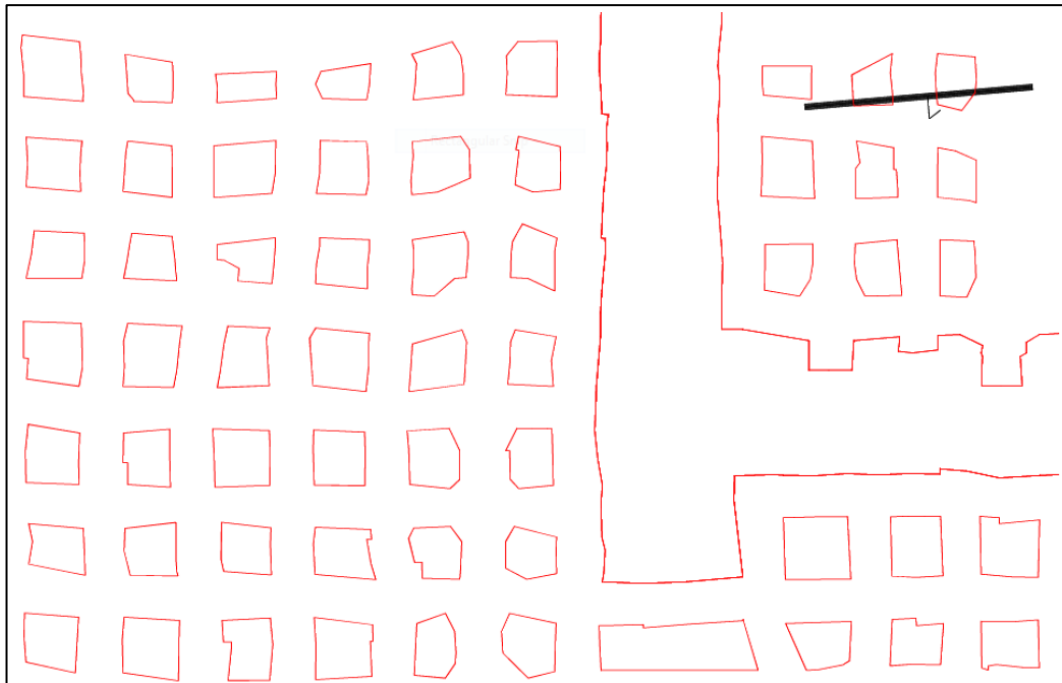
Underground pillar plan used for opencast pillar exposure and extraction (Rorke *et al*, 2016)
